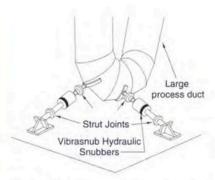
This illustrates a typical use for "VIBRASNUB" Hydraulic Snubbers in a two-plane assembly on a large U-bend in a modern refinery. The snubbers allow slow expansion movements to occur but dampen out shock and vibratory movements.
